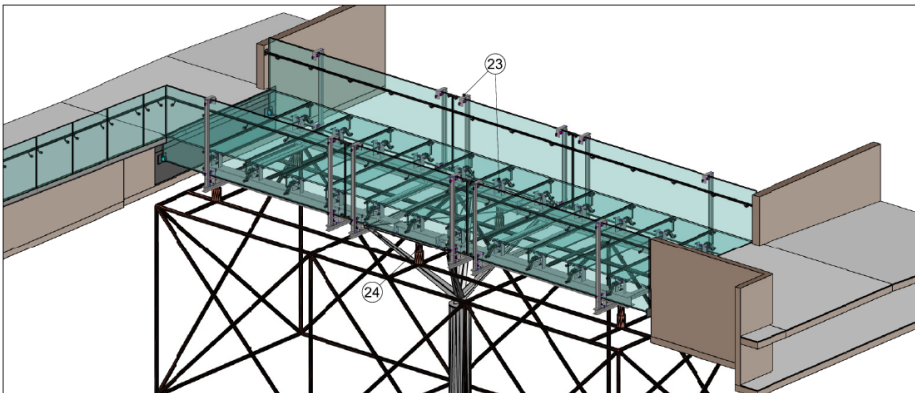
Installation Sequence 13) Installation of the balustrade connection steel bars
